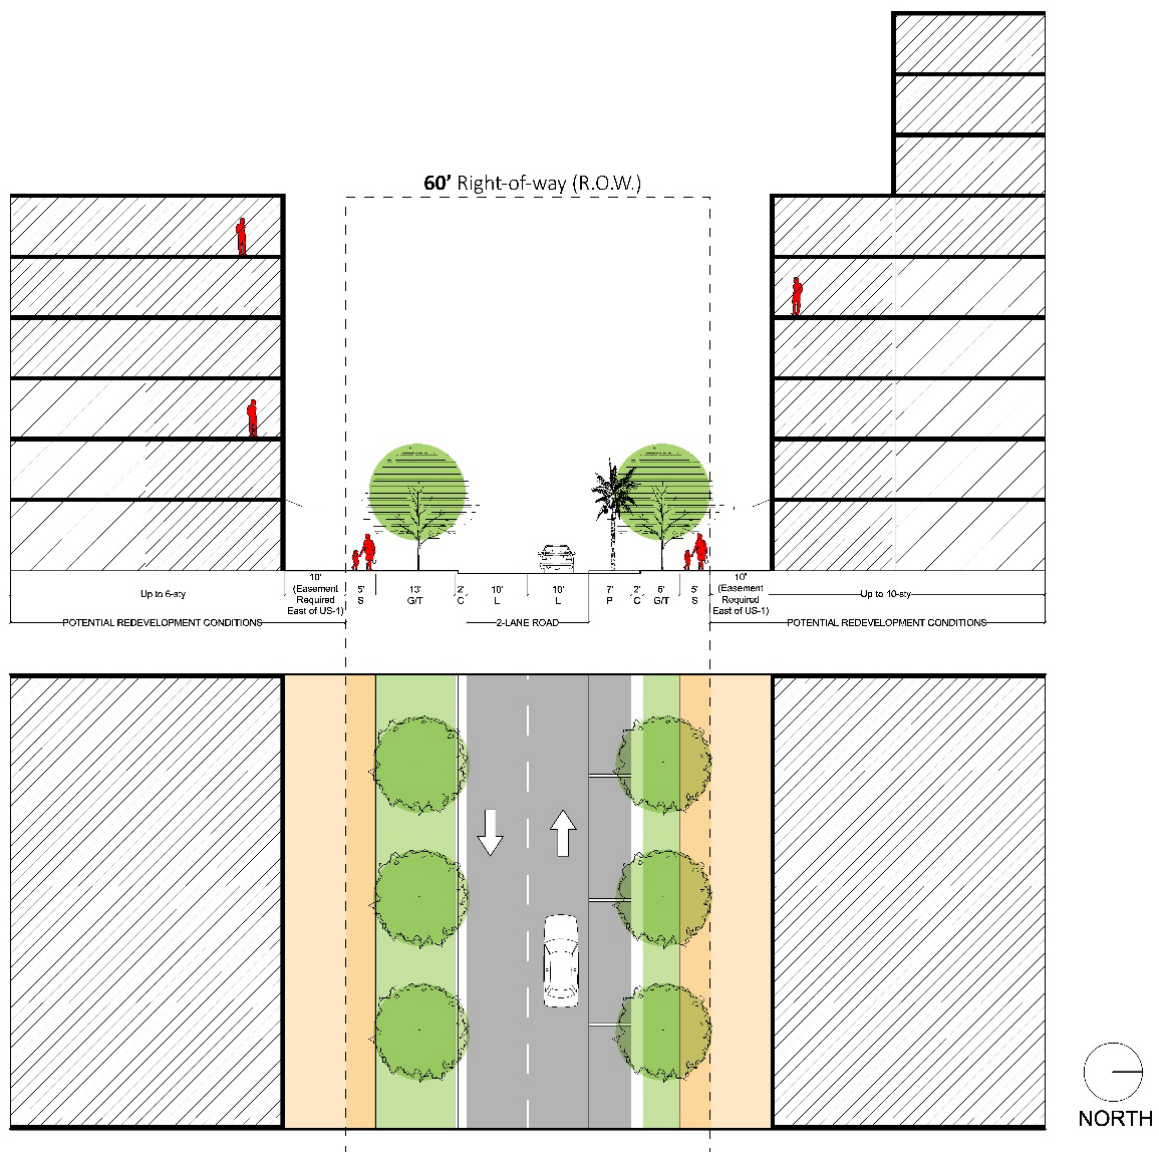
F.10: Tertiary Streets with Parking, One Side Street Design
